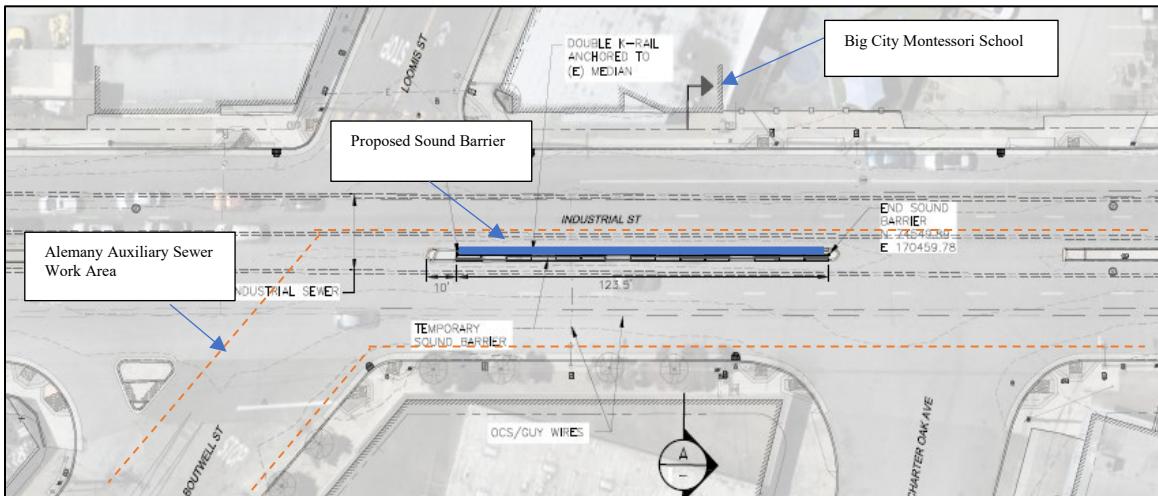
Proposed Temporary Sound Barrier Plan on Industrial Street
